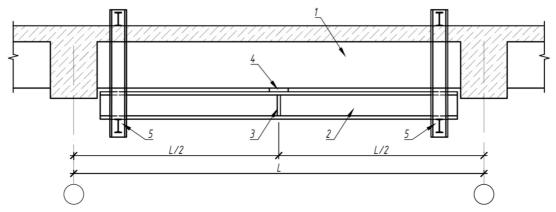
Strengthening of the reinforced concrete beam of the monolithic floor slab with the prestressed steel beam on the clamps
